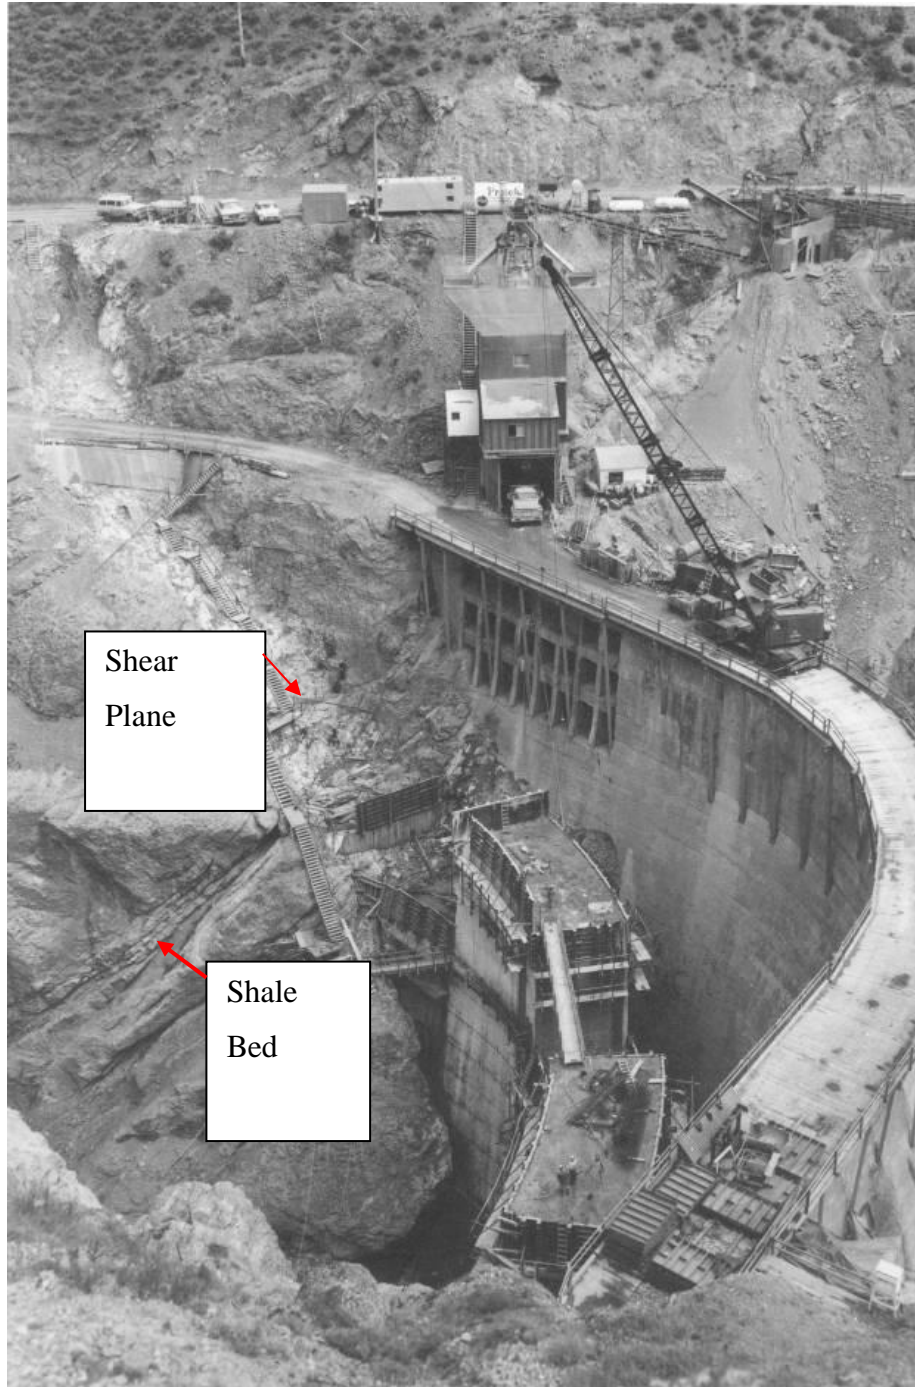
Construction Photo Showing Major Discontinuities (note new arch dam being constructed immediately downstream of an existing arch dam)
